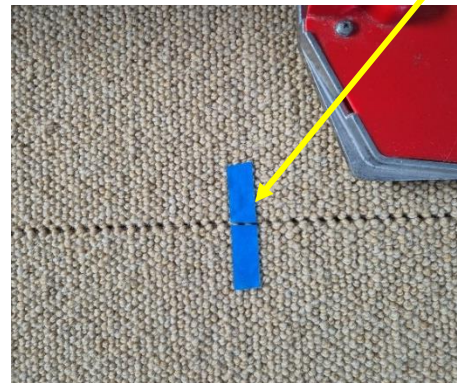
Straightening up the carpet rows when attaching to the carpet gripper will create pressure if there is a hook.
